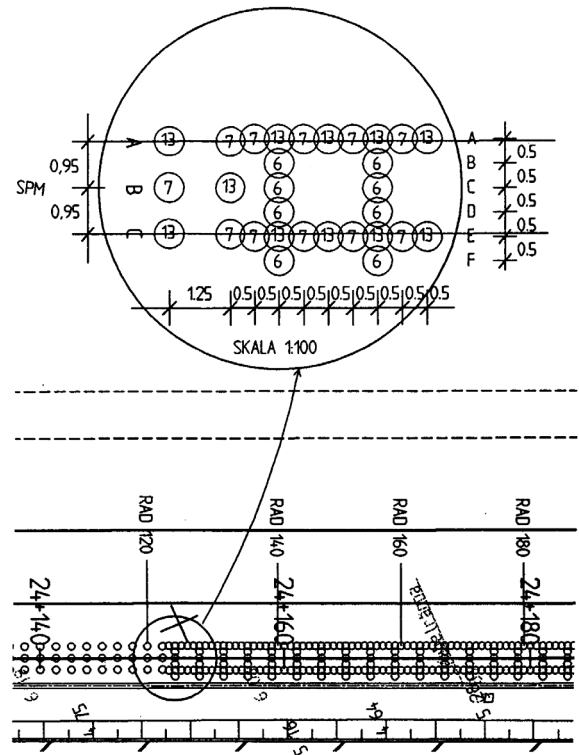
Layout of soil improvement with lime-cement columns at Ledsgård. Also showing the transition at section 24+150. Column length below rail level is given by figures inside circles, (J&W / WSP, 2000).
